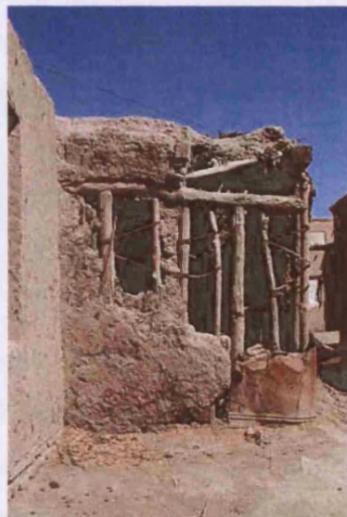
Abandoned *sintch* building, with earth infill, Khiva, Uzbekistan (UZ01_0047).
